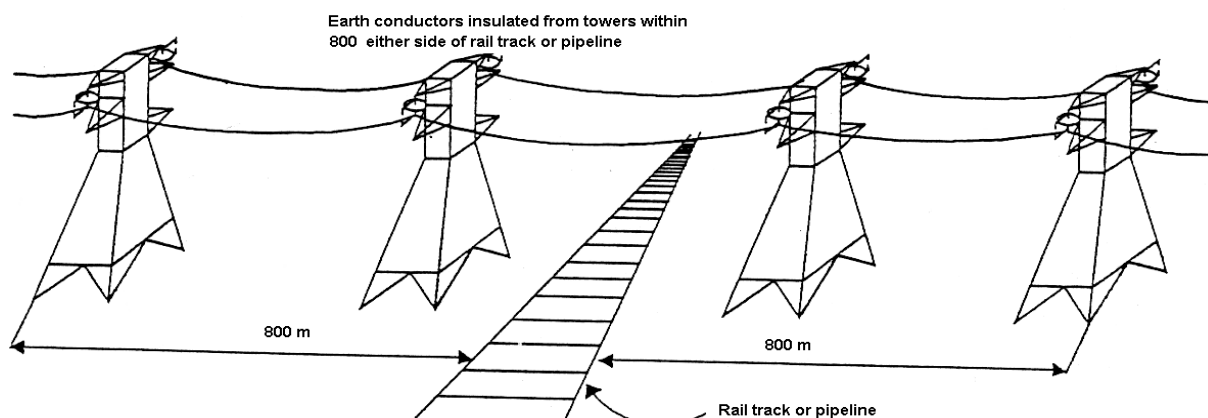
Insulation of earth conductors on suspension towers crossing rail tracks or pipelines
